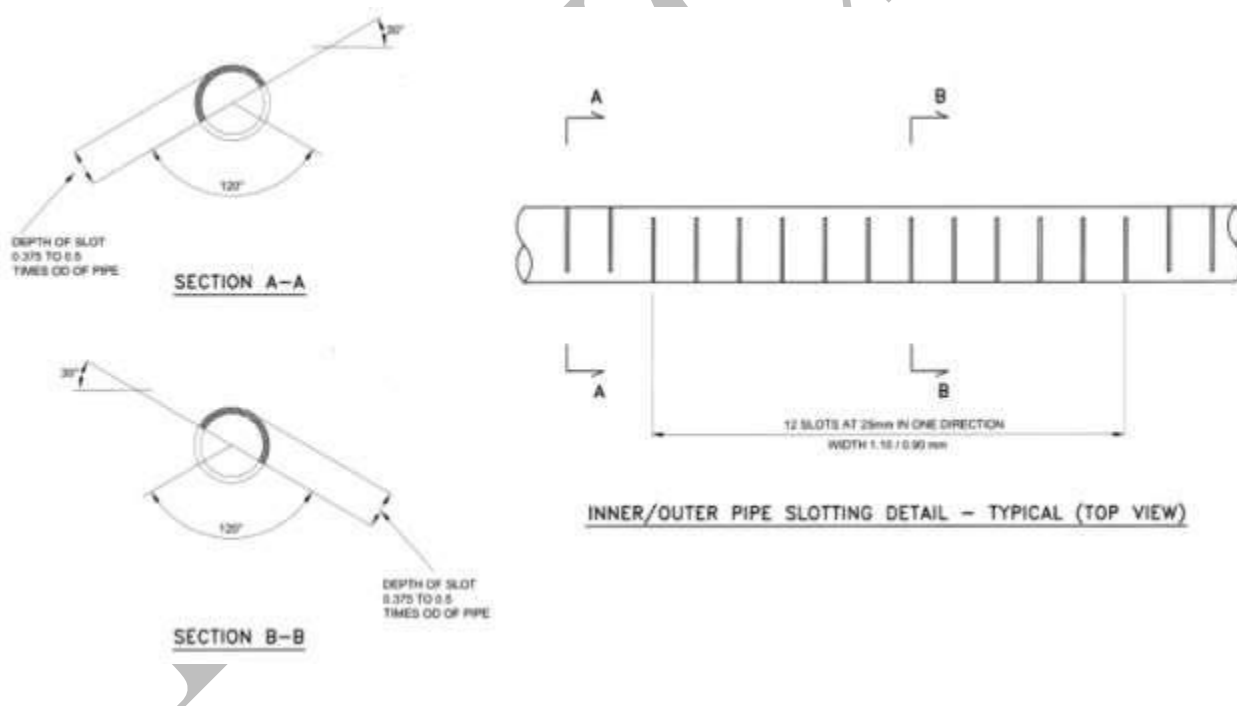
Horizontal Drain Perforation/slotting Detail
